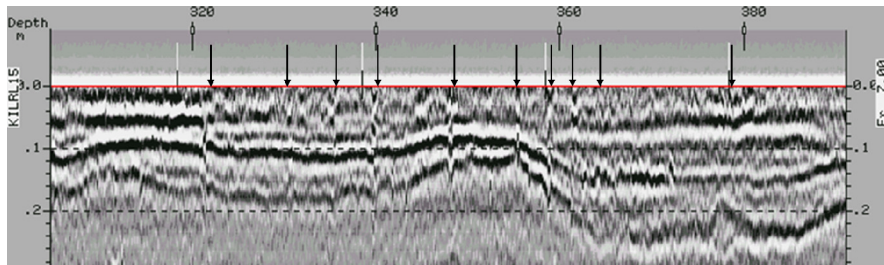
Cracks in an asphalt covered concrete road built on peat in Scotland.
